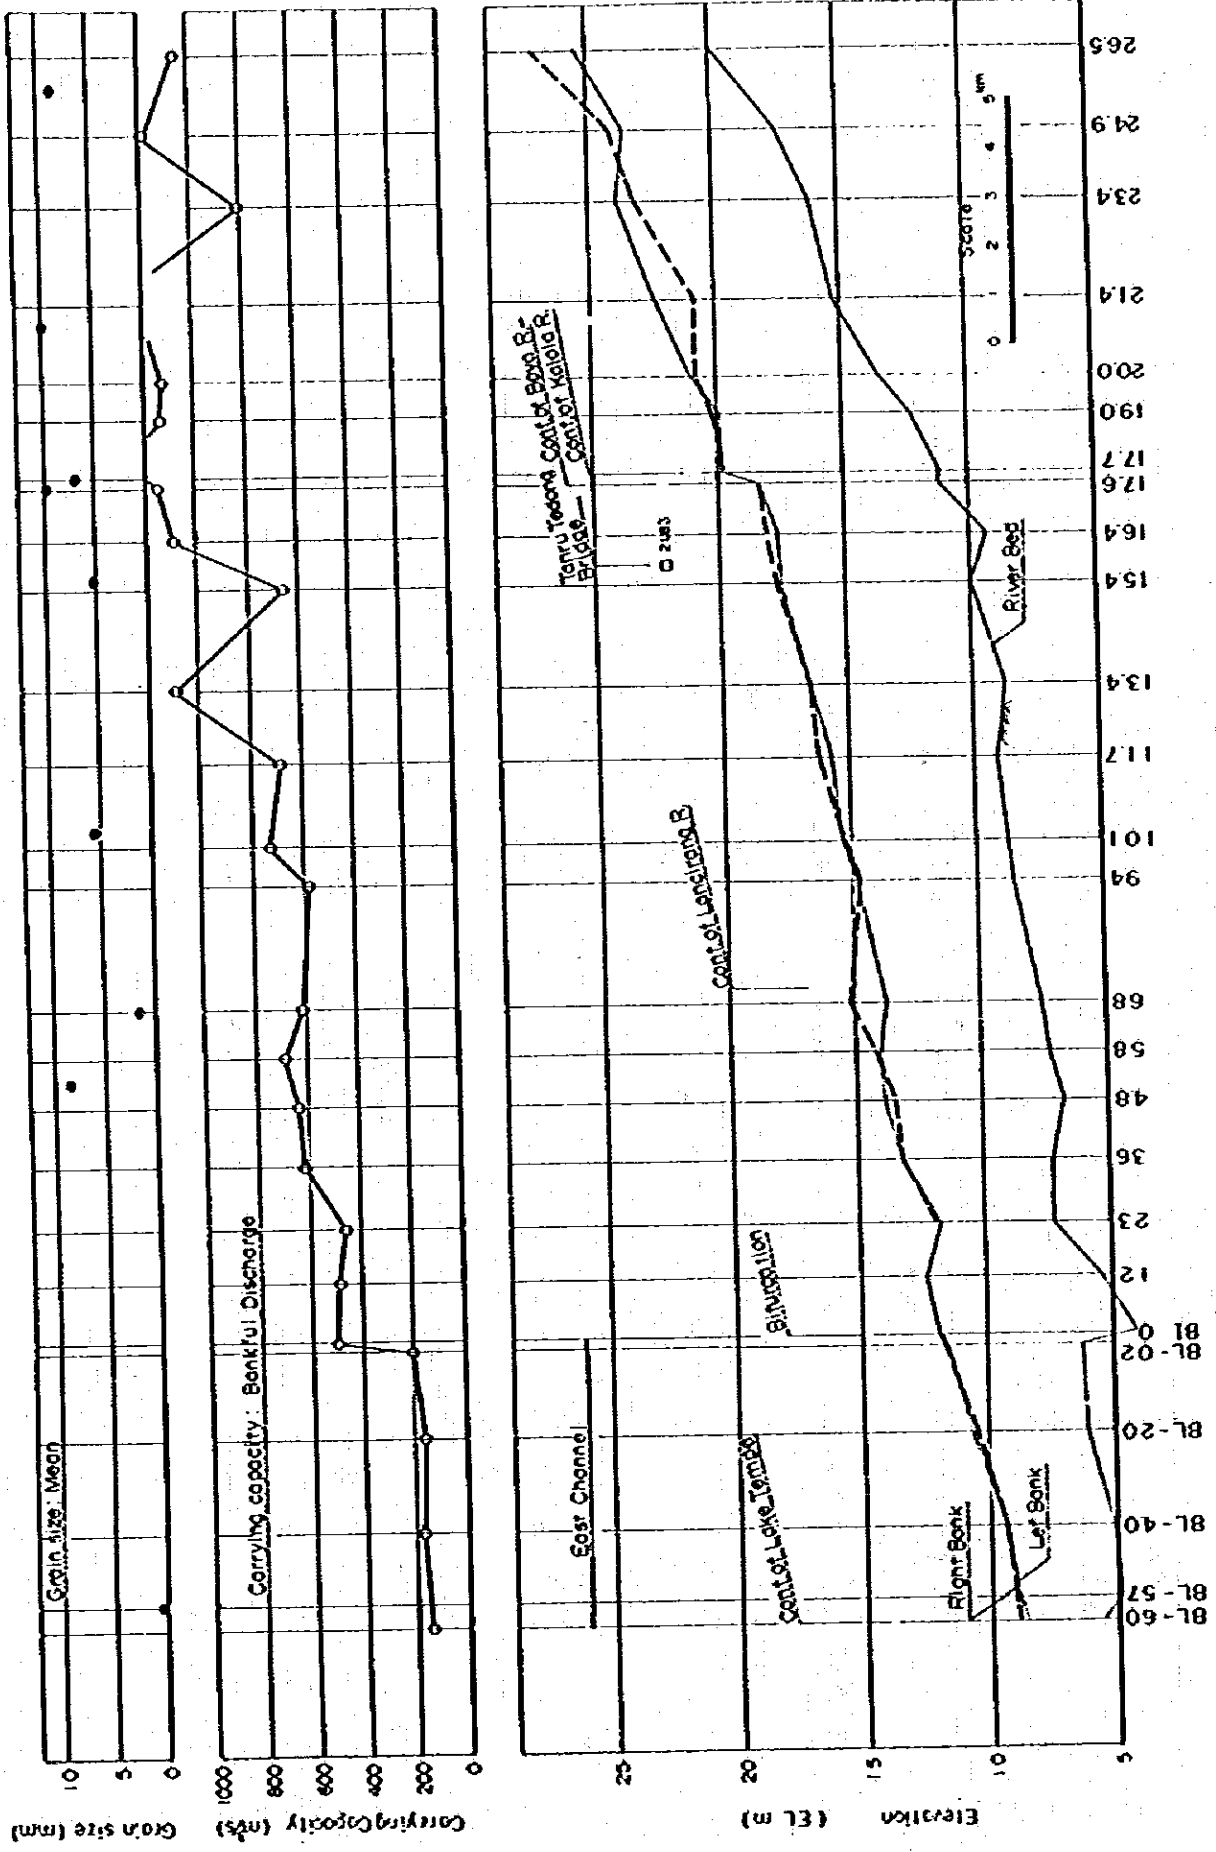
EXISTING LONGITUDINAL PROFILE (1/2)
